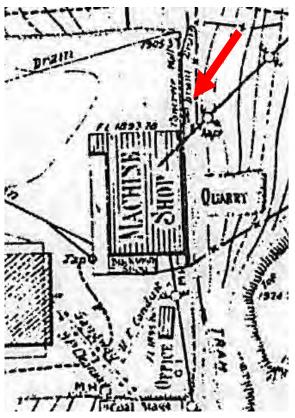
Detail from 1916 Survey Plan with the concrete retaining wall identified. (Source: NAA: A6664, L165A, 1916)
